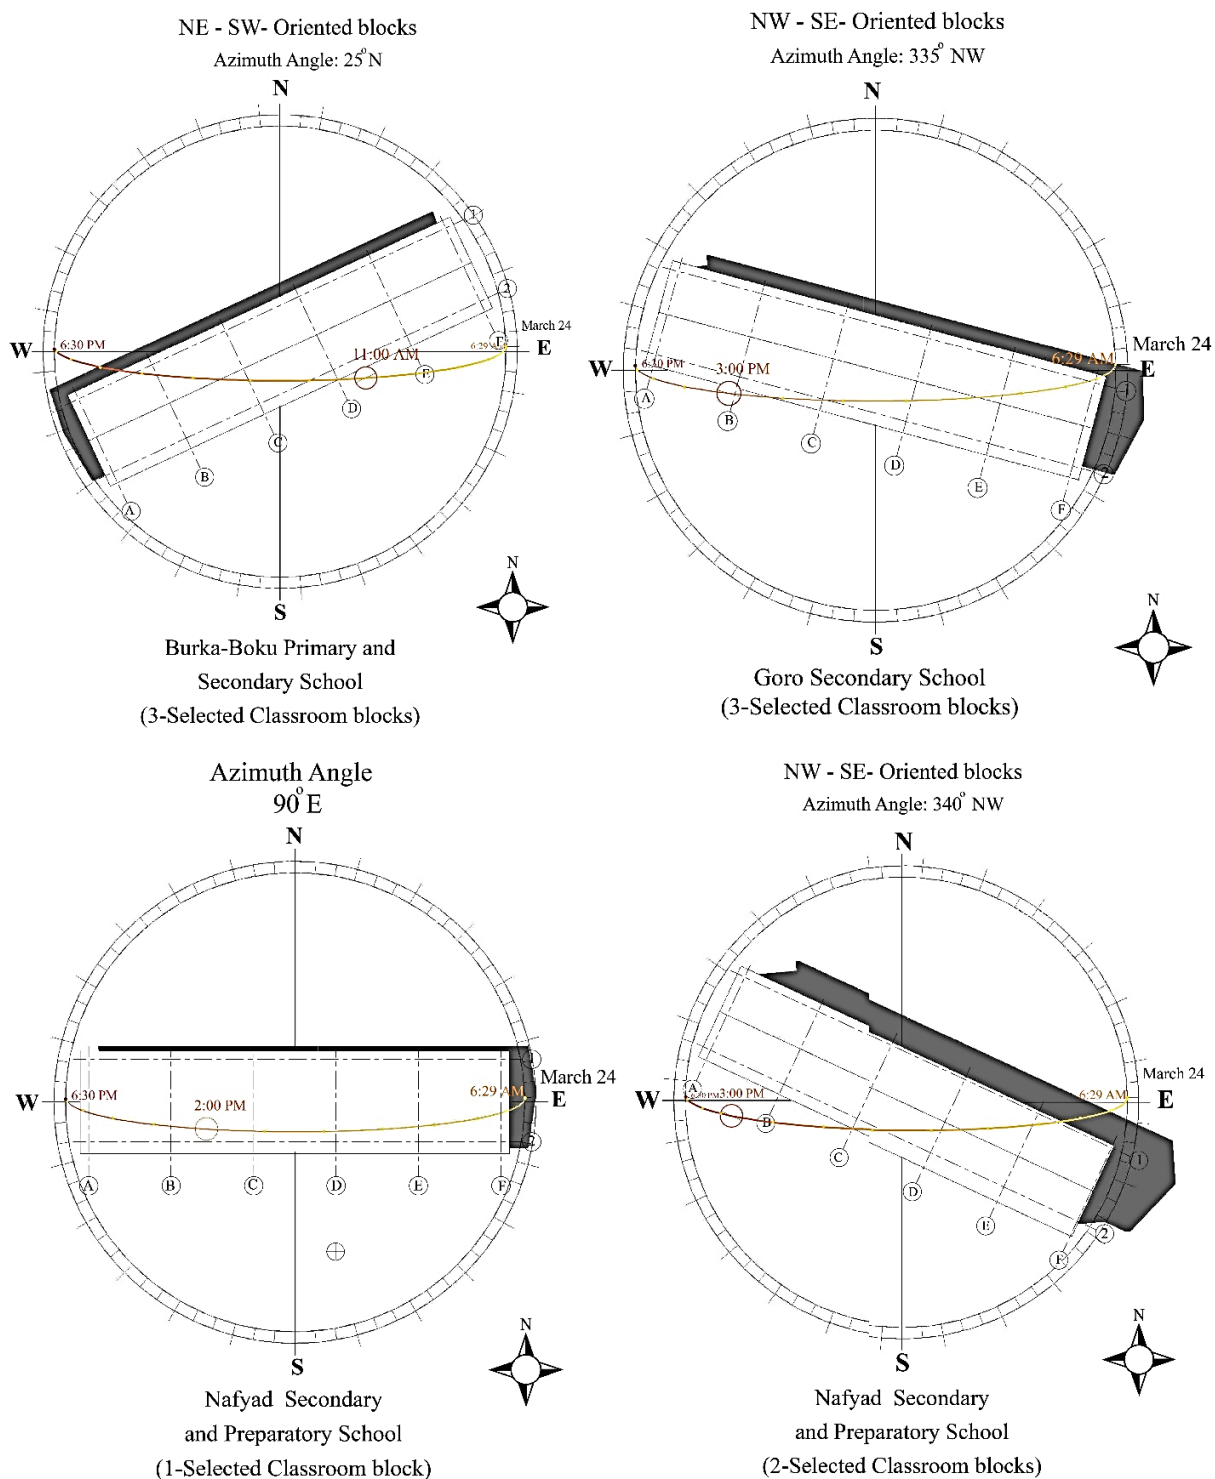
4 Building orientation and sun path diagram of selected school buildings (Source: Author, 2024)
